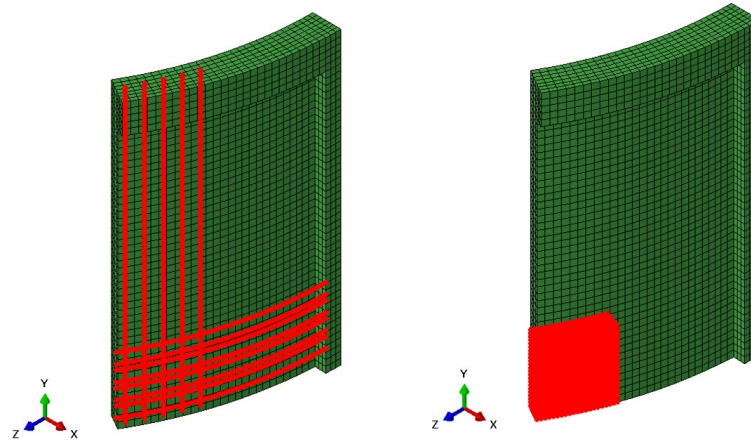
FEM – De-tensioned Tendons (Left) and Future Concrete Opening (Right)
